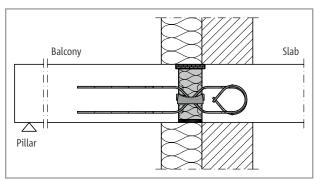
Schöck Isokorb® T type Q-VV: Connection with thermal insulation composite system (TICS) (e.g. T type Q-VV1 to T Typ Q-VV5)
